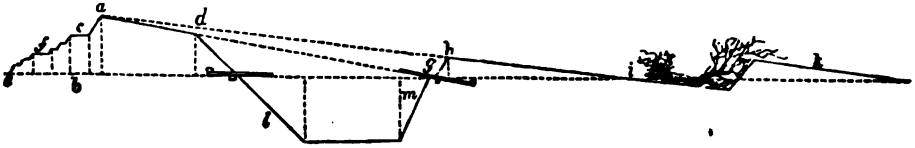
Section of Parapet, Ditch, and Glacis.
